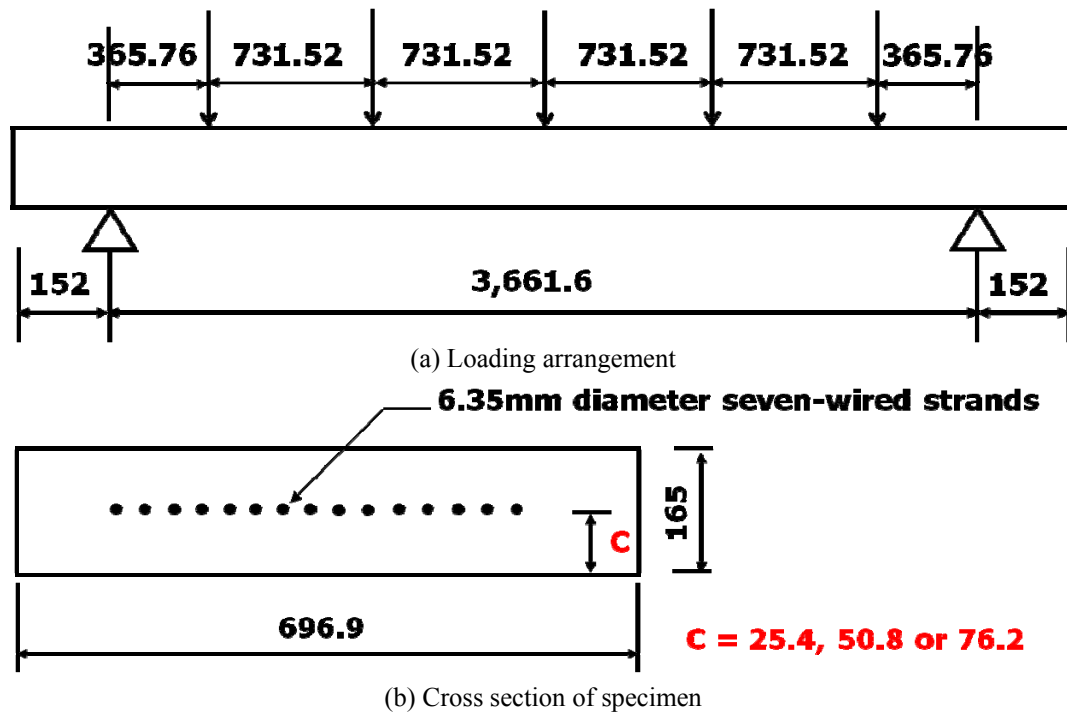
Specimen details for fifteen-6.35mm tendons and 3,661.6mm span (Gustaferro, 1967)
